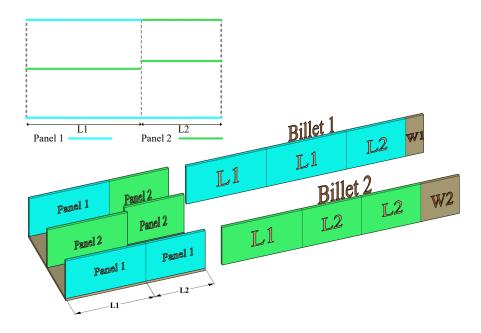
Illustrative example of a structural floor plan in 2D (top left) and 3D (bottom left), and billet cuts based on the wall lengths
